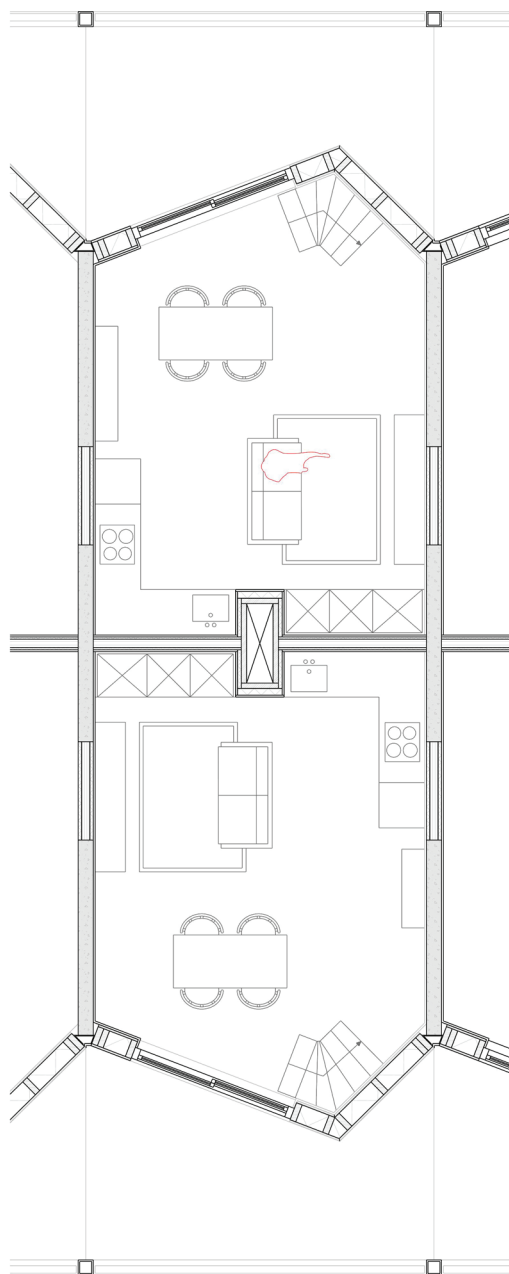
Mezzanine apartment ground floor, 1:100. Drawing by author
